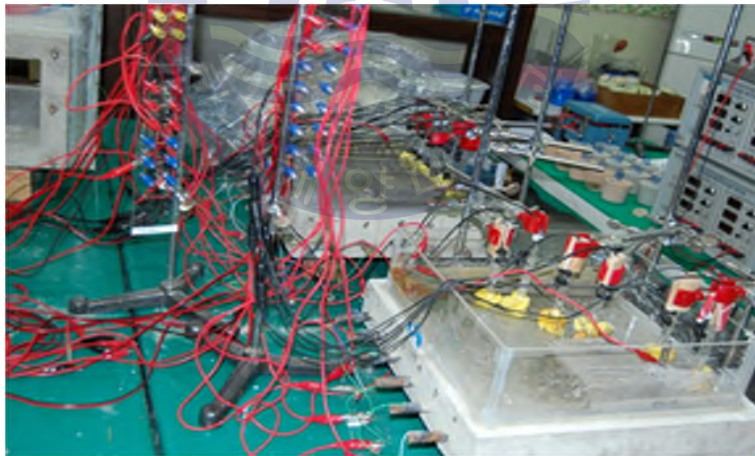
Picture of cathodic protection test on the slab type concrete specimens
